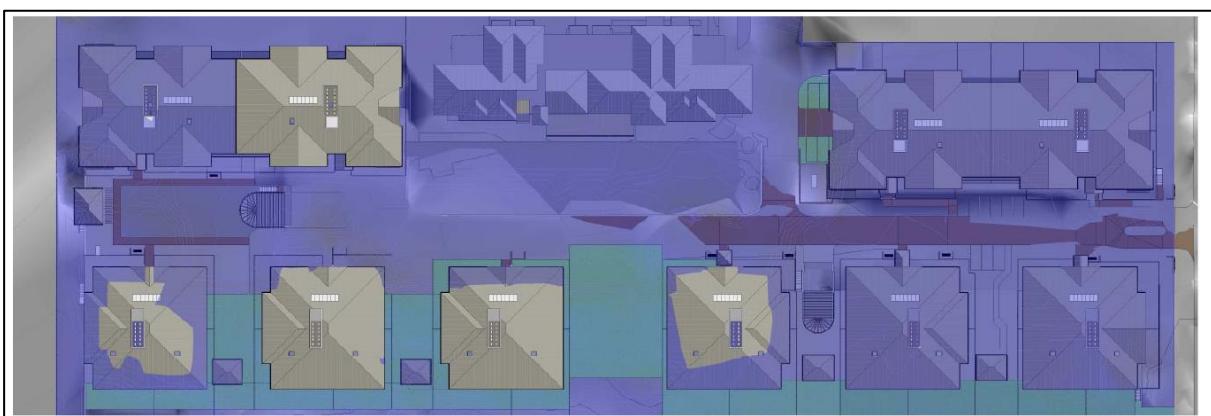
Proposed development with the height of buildings overlay of 12m (blue) (Source: applicant)
